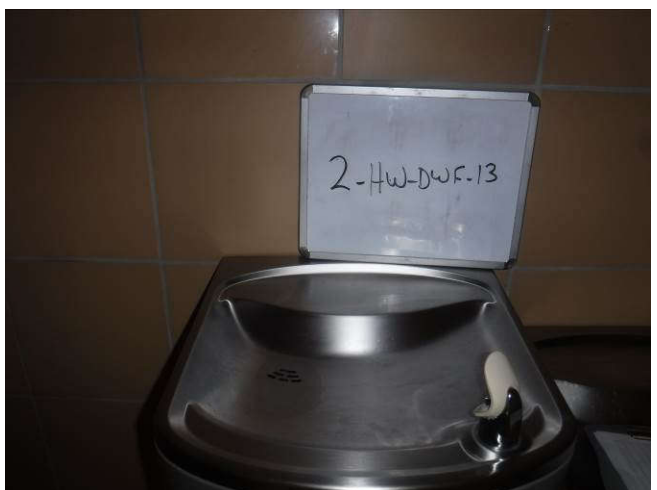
Drinking water fountain, between restrooms in 2nd floor (left fixture)
